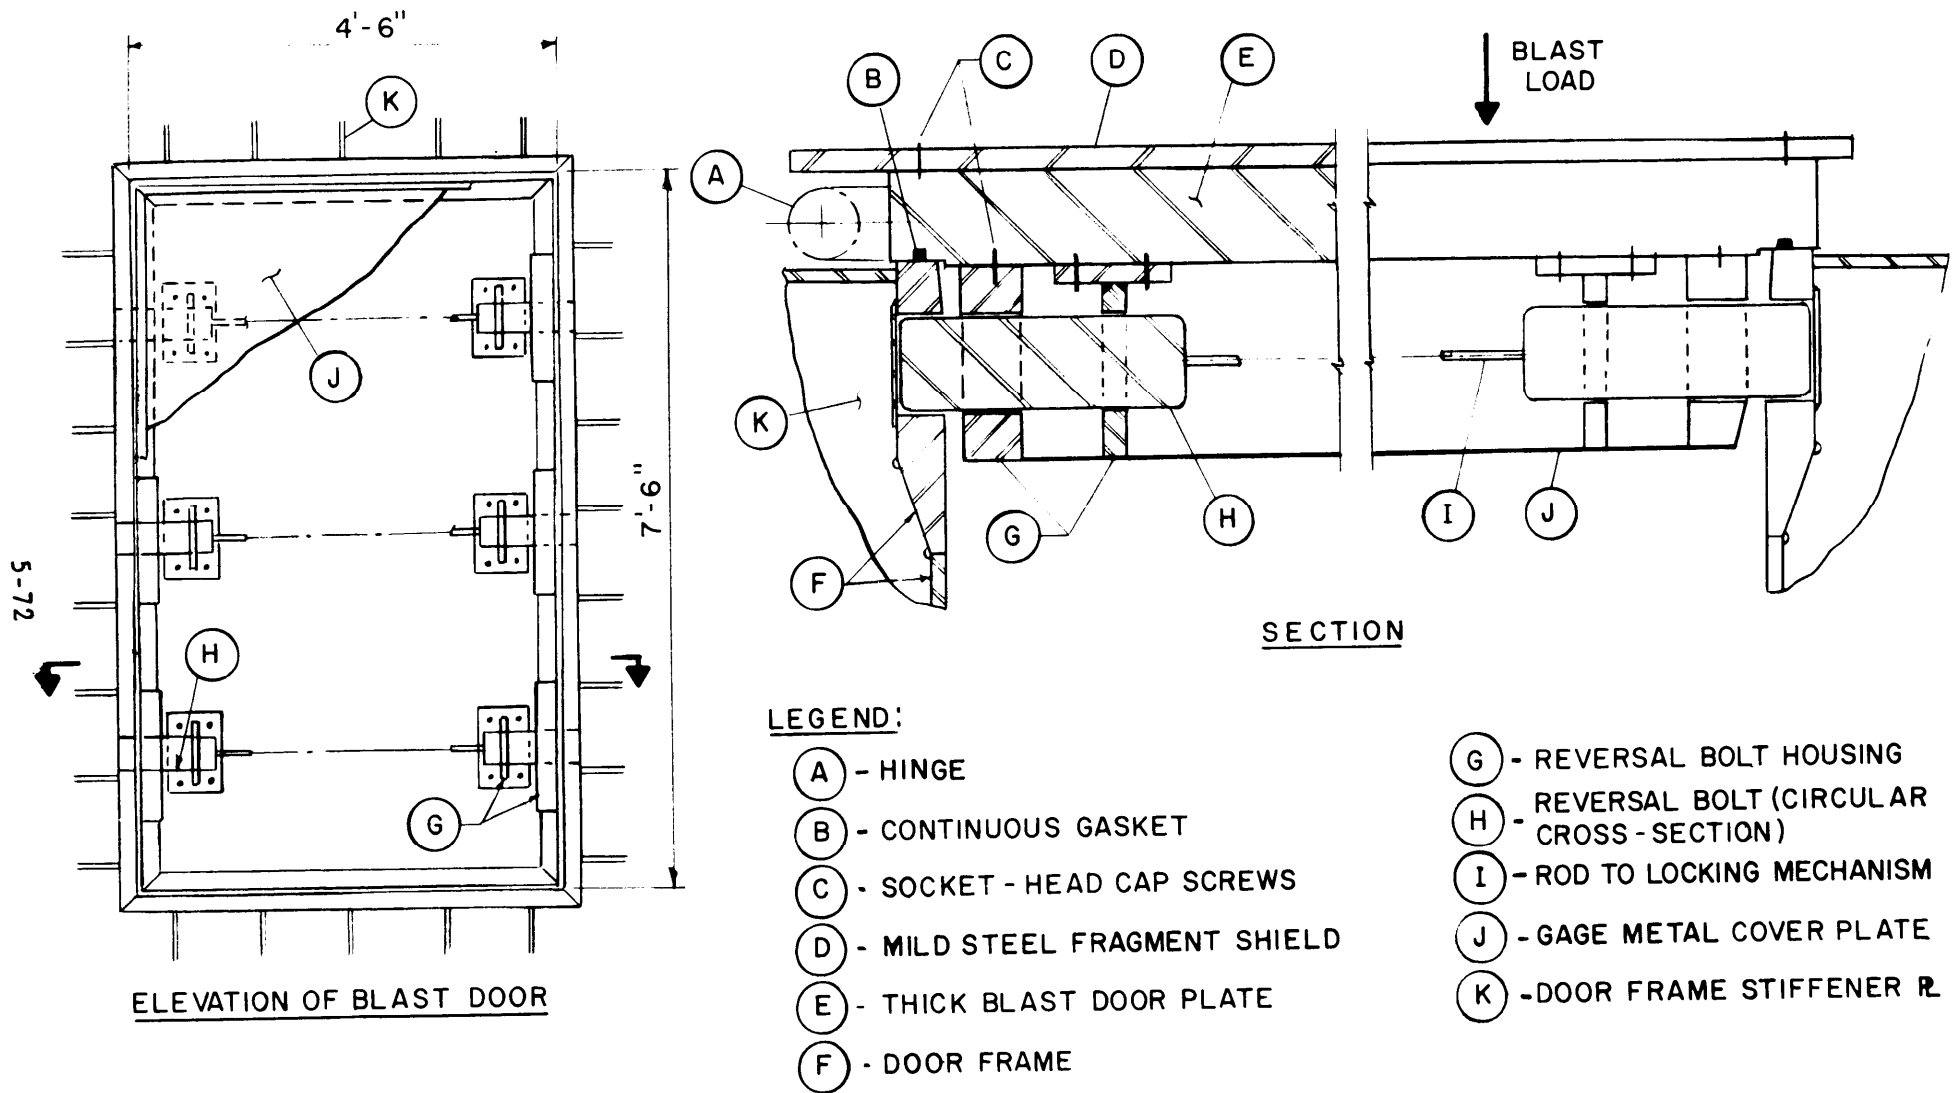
Single-leaf blast door with fragment shield (very high pressure)
